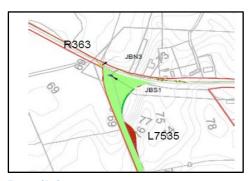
Detail B shows the second joint bay on the Northern Cluster cable (JBN2). The drain from Cuilleenirwan Turlough, which the cables must cross under is also shown. This drain is part of
